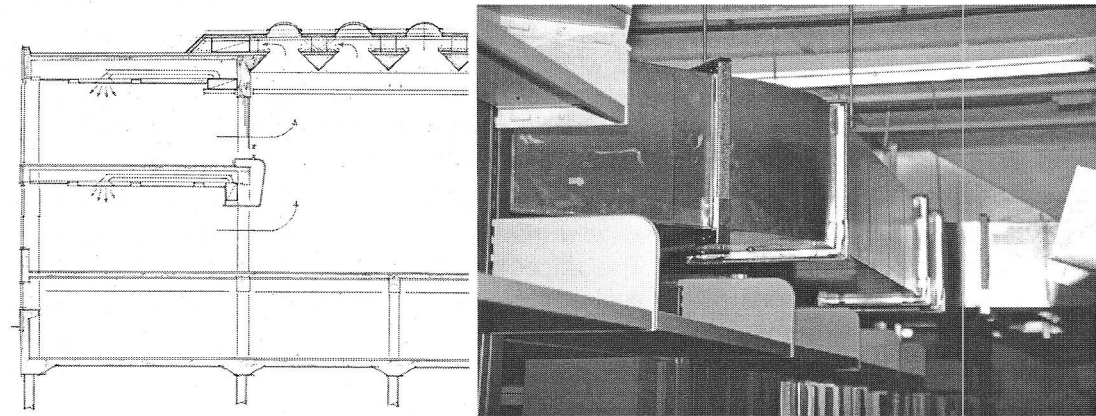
A drawing from the new section. The roof has been lifted to create space for ventilation ducts. Drawing of P.H. Tauber 1998.
